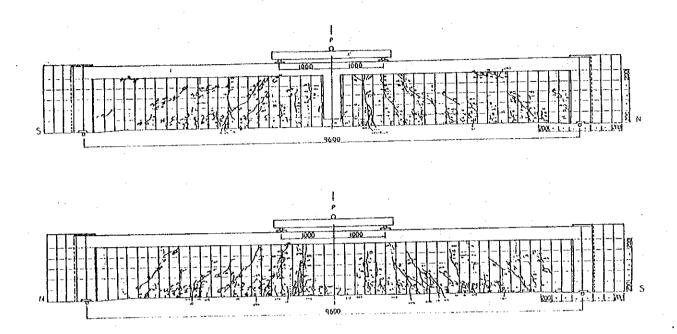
Cracking of Girders due to Ultimate Bending Test (Laboratory Test)
